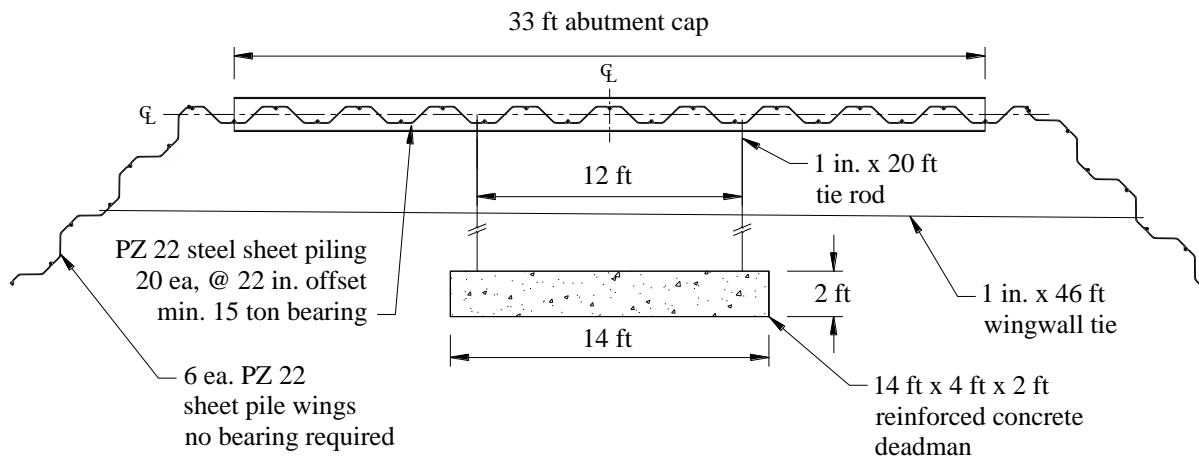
Plan view of sheet pile abutment and backfill retaining system for demonstration project in BHC, Iowa
